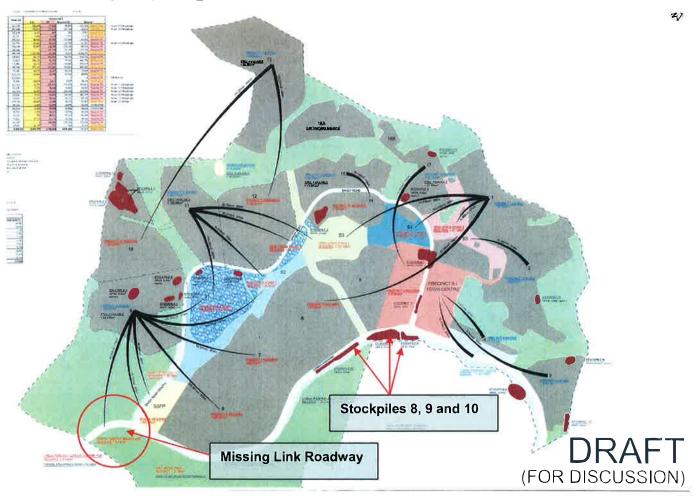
Location of Stockpiles 8, 9 and 10 to be placed on the Missing Link Roadway
